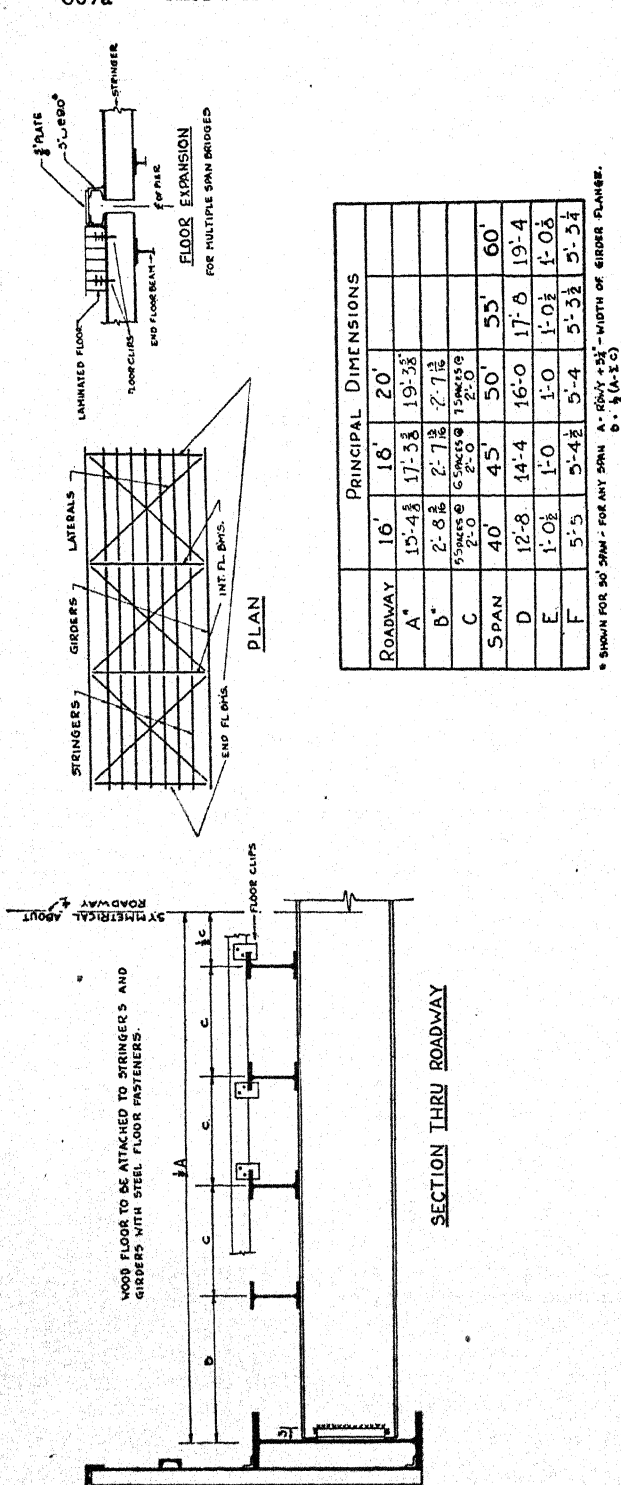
Design of superstructure and steel rolling for arc welded three-panel deck steel girders. See also page 607b.
